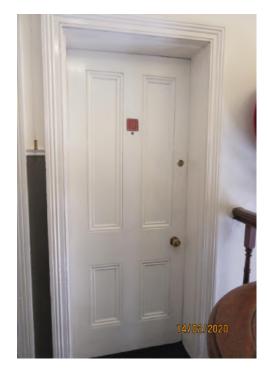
The door leading from space 2.02 to space 2.17 (Room 9). The four panel door joinery is typical of the original (1887) section of the building and the door leaf, architraves and skirtings are original. Source: TKD Architects 2020.
